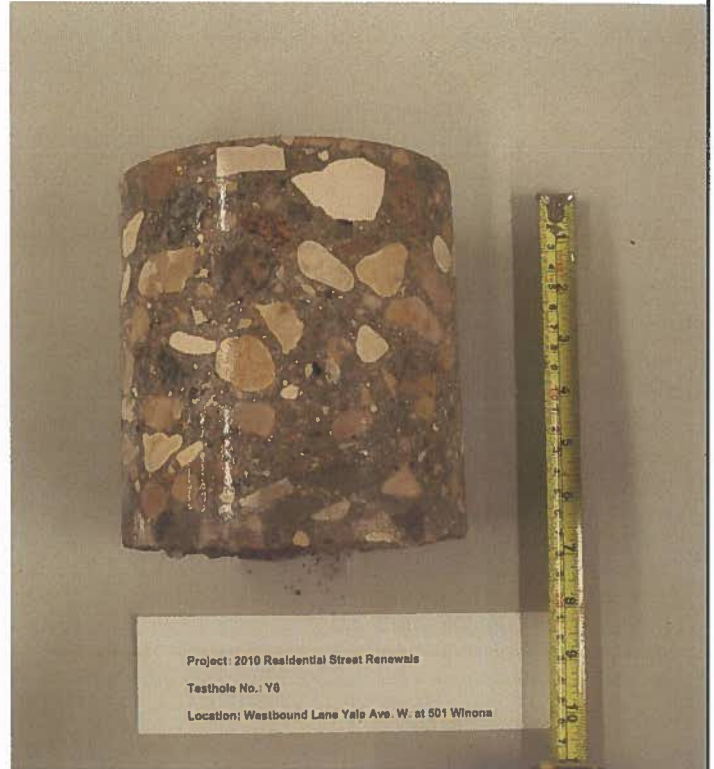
Test Hole Y6: Westbound Lane, Yale Ave. W. at 501 Winona, 15 m W of W sidewalk at Winona St., 1.9m S of N curb
